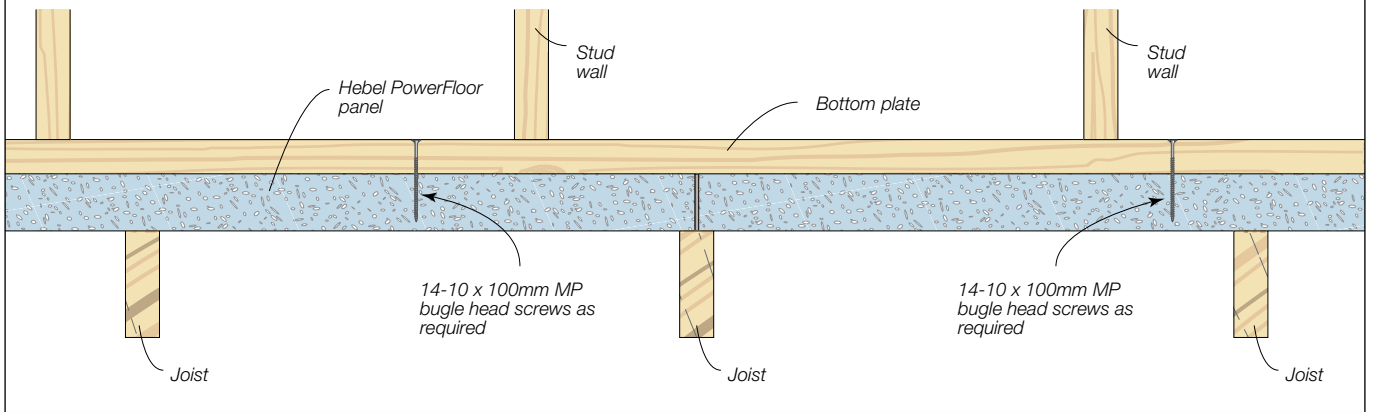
Joists Blocking Detail Under Loadbearing Walls Running Perpendicular to Joists
